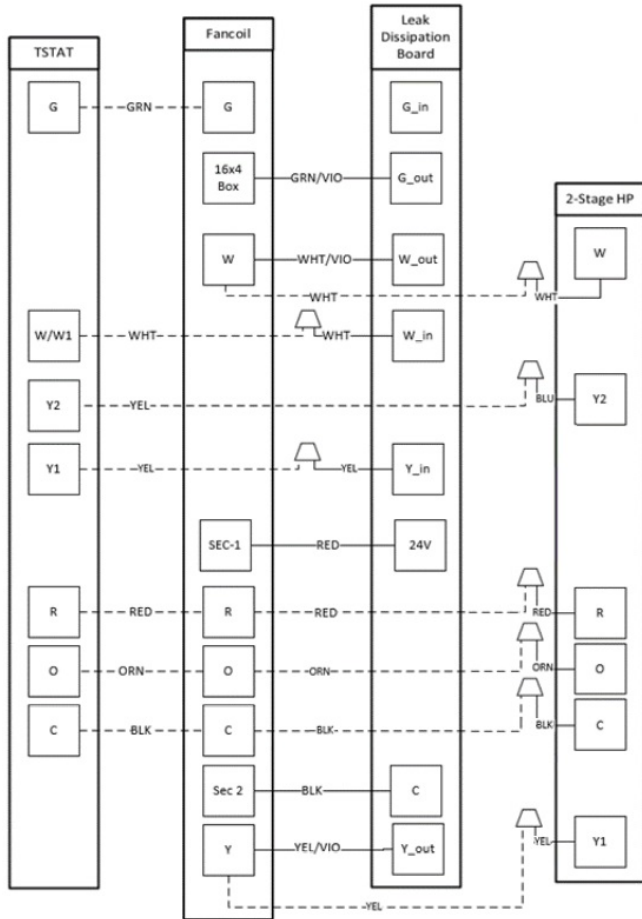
2-Stage Heat Pump Tstat Wiring with Fan Coil Control, Sensor Control Module, and Leak Dissipation Board
